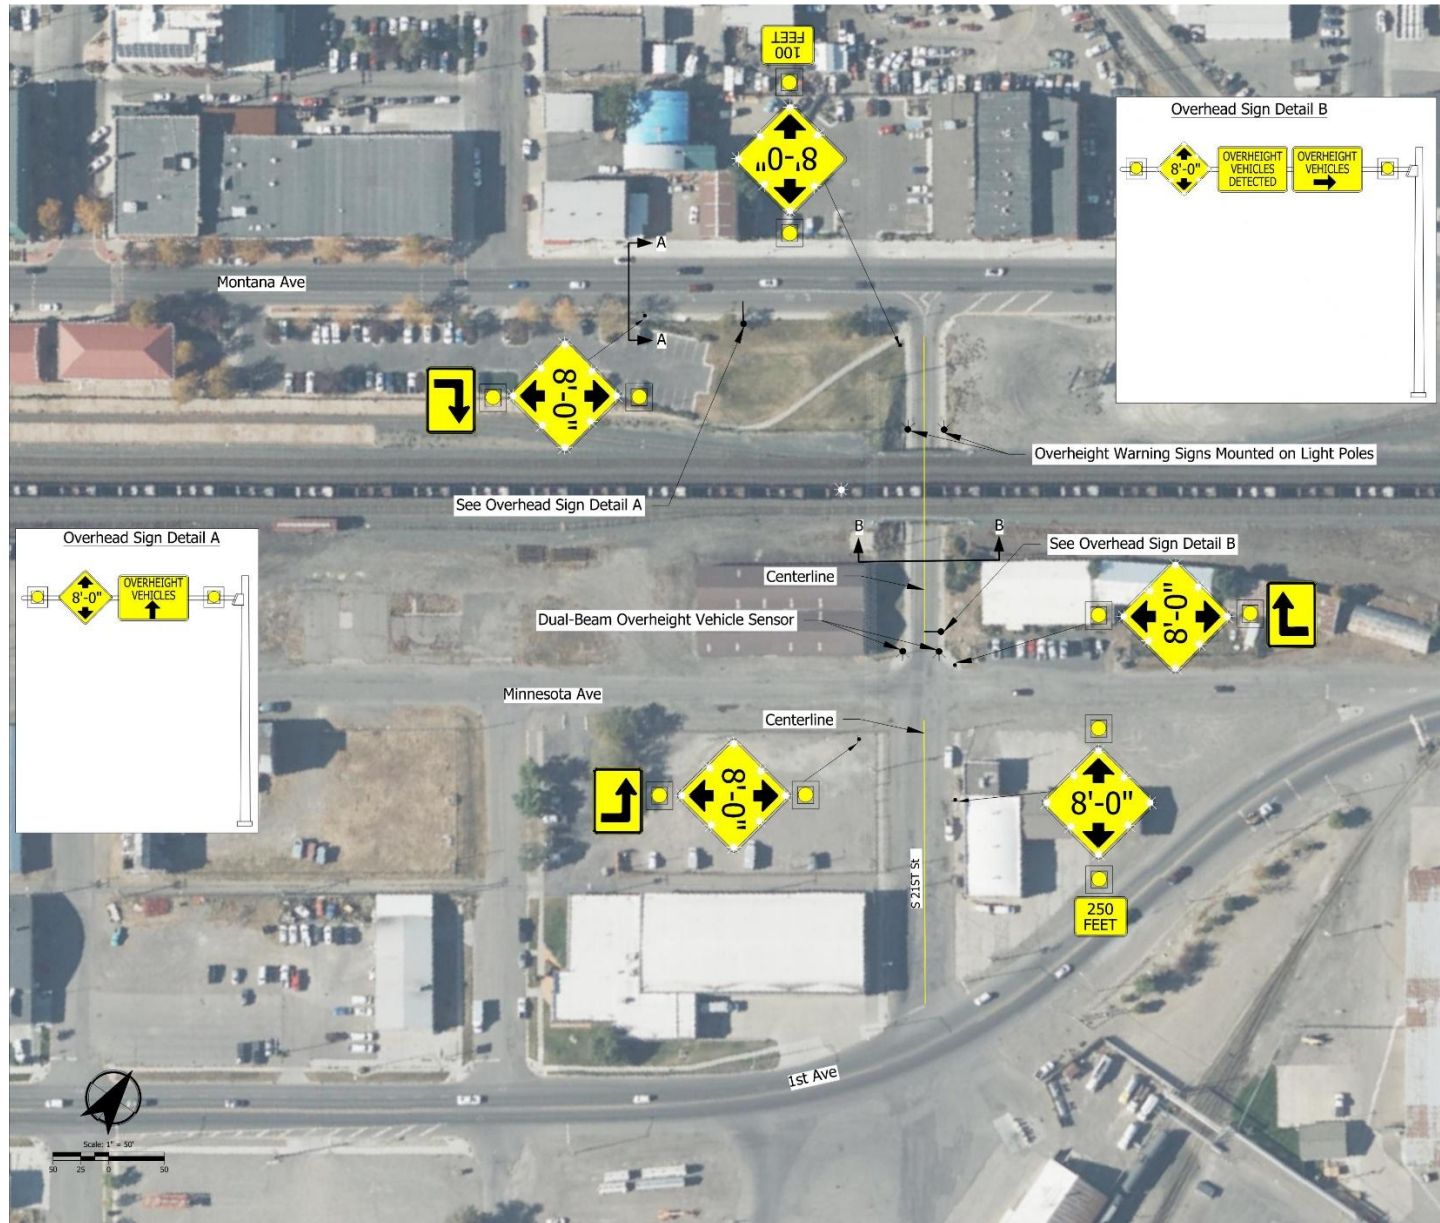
shows a concept for the proposed warning system. Figure 11 shows cross-sections of Montana Avenue and 21<sup>st</sup> Street. Figure 12 shows a rendering of the existing bridge structure with the proposed warning system.
